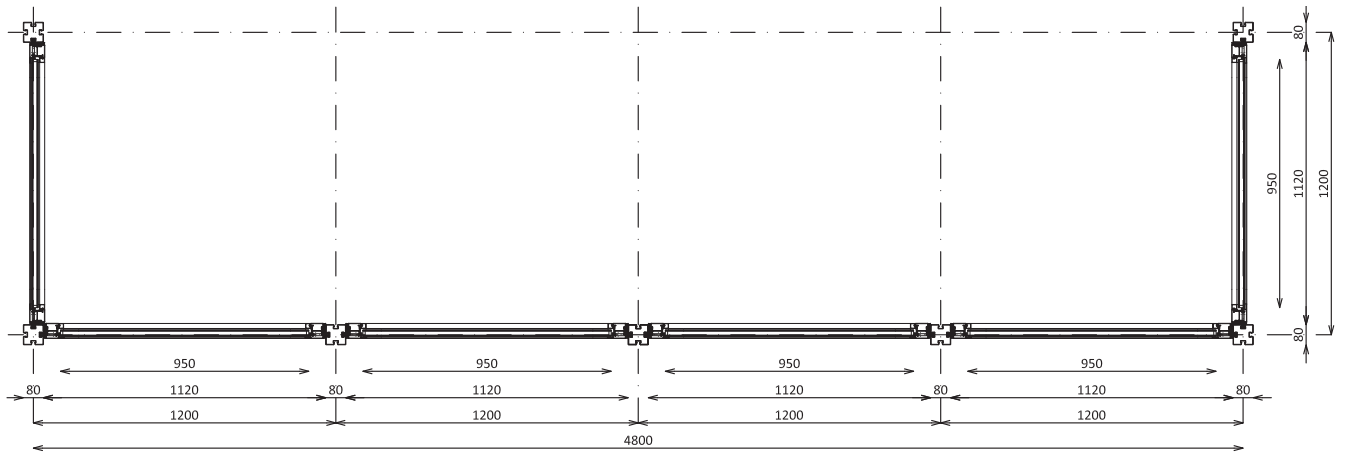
Floor plan reversible extension unit of the GTB-lab, with a steel curtain wall with improved functionality (type F-SN D2).
